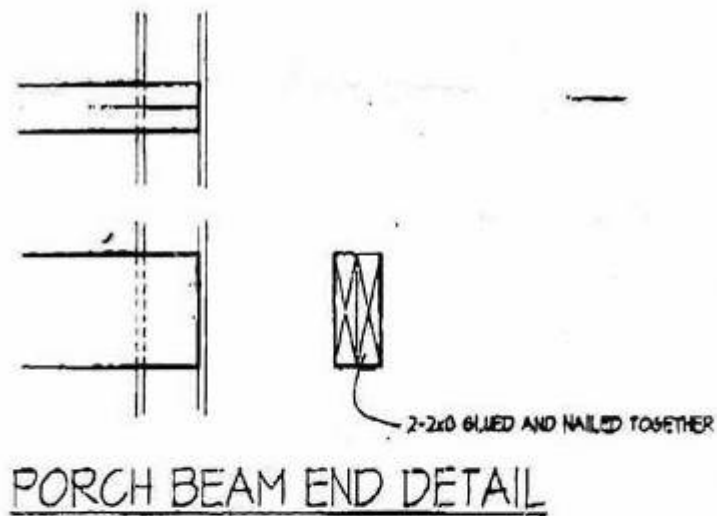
(top). ZEH4 porch beam detail. Figure 36 (bottom). Ridge beam detail.
